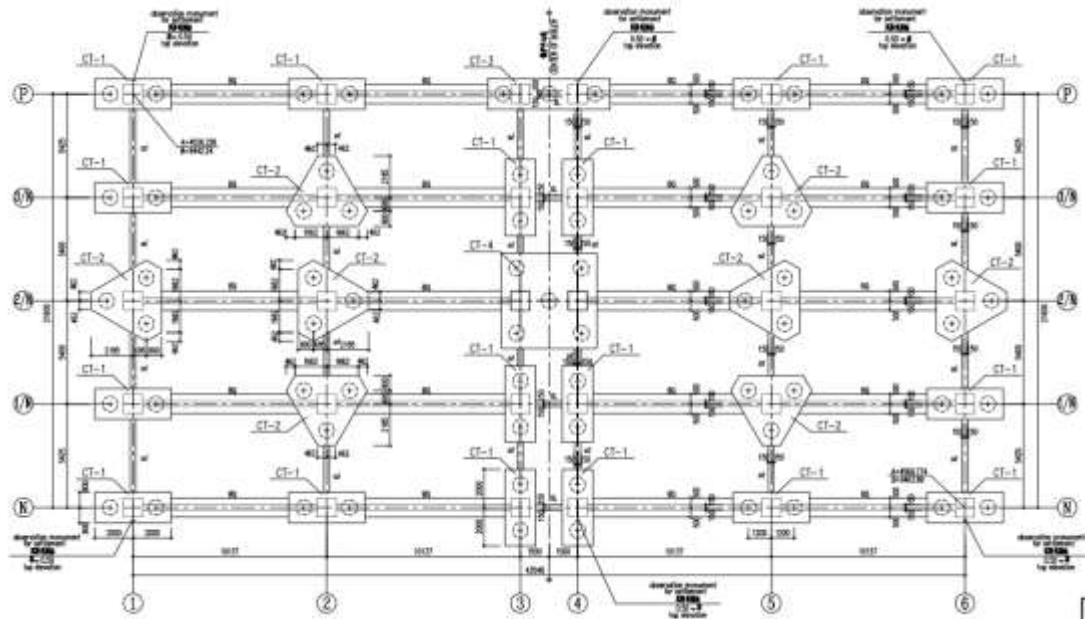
Plan view of the foundation of the chimney support frame area.
